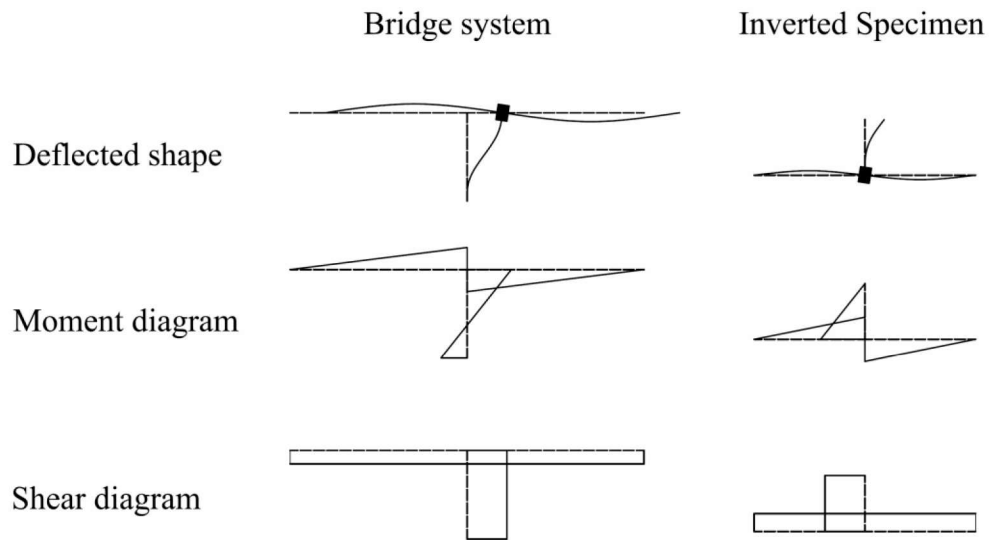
Deflected shape, moment diagram and shear diagram of bridge system and inverted specimen under longitudinal excitations.
